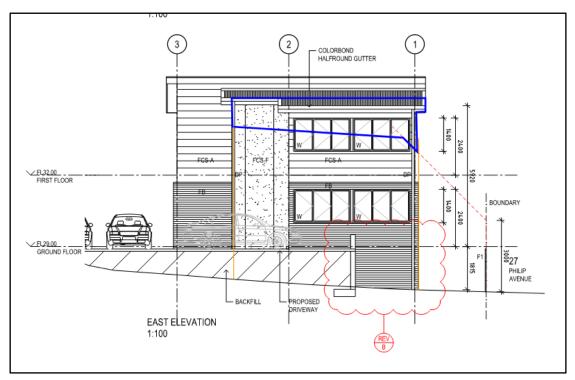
Graphic identifying the protrusion from the building envelope as advertised
